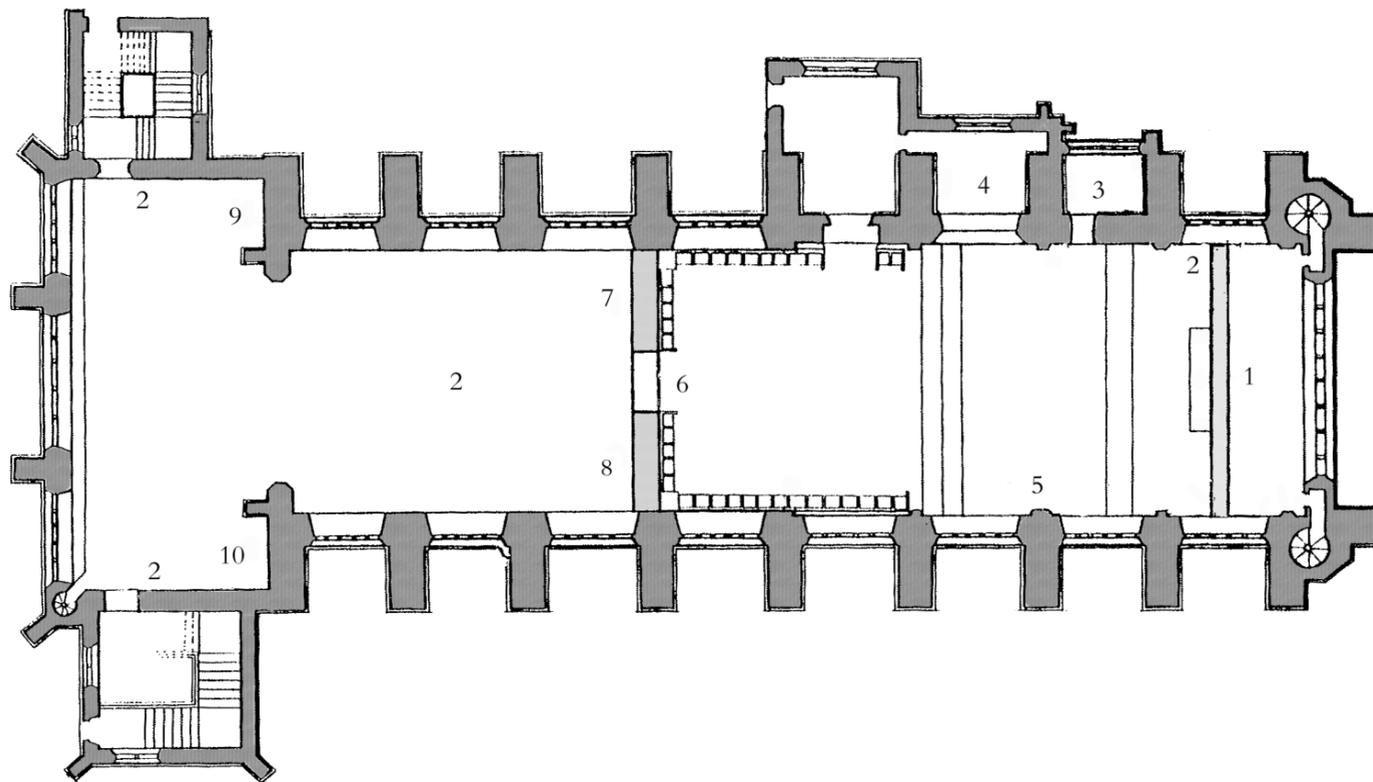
Eton College Chapel: early sixteenth-century floor-plan (adapted from a plan by Andrew Martindale based on an original plan by Willis/Clarke)
